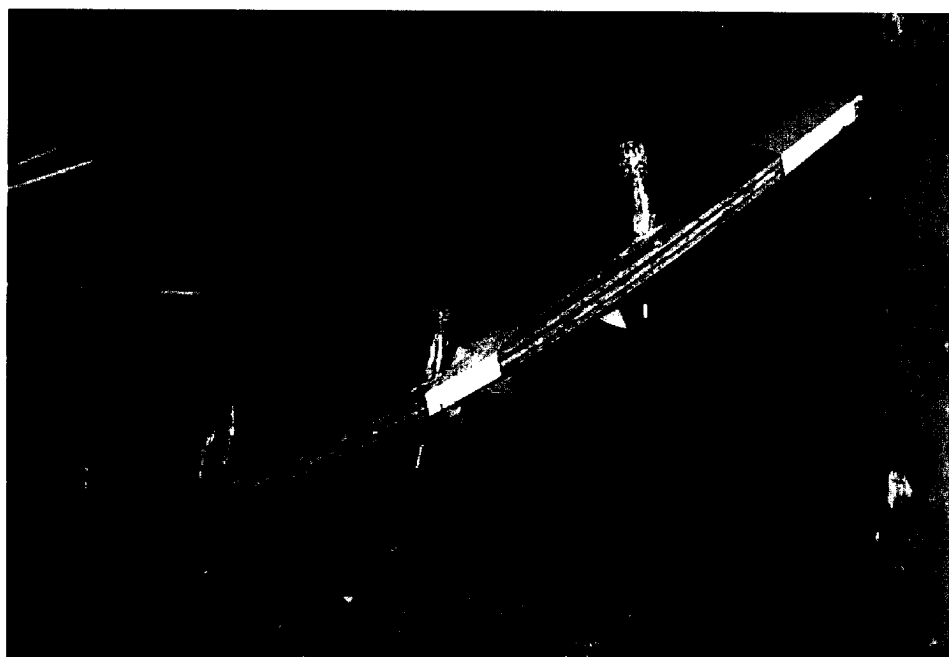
The detached strip with end anchor bolts from Beam TS 18
